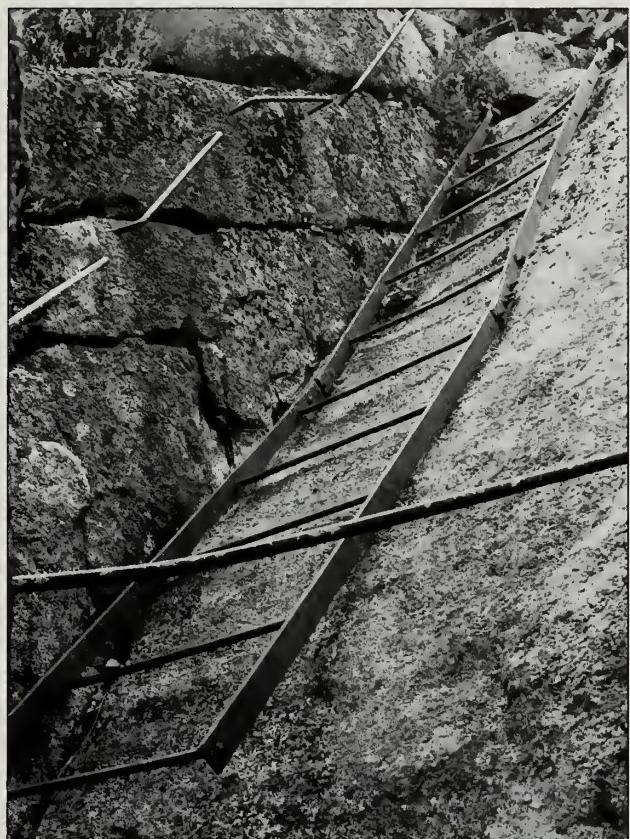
Rung handrails and ladder on the Ladder Trail (#64).
